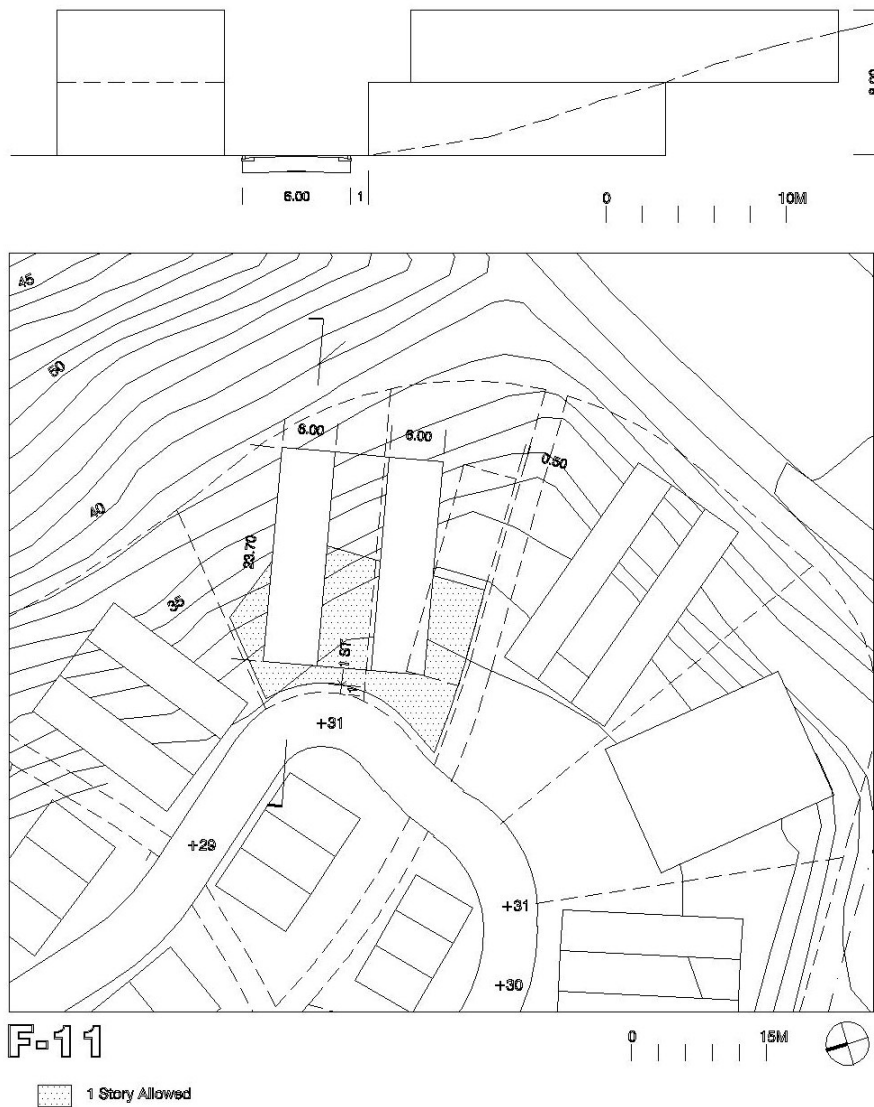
Site F-11. This site allows two 2-story 'podium' type buildings on a 1-story platform.
